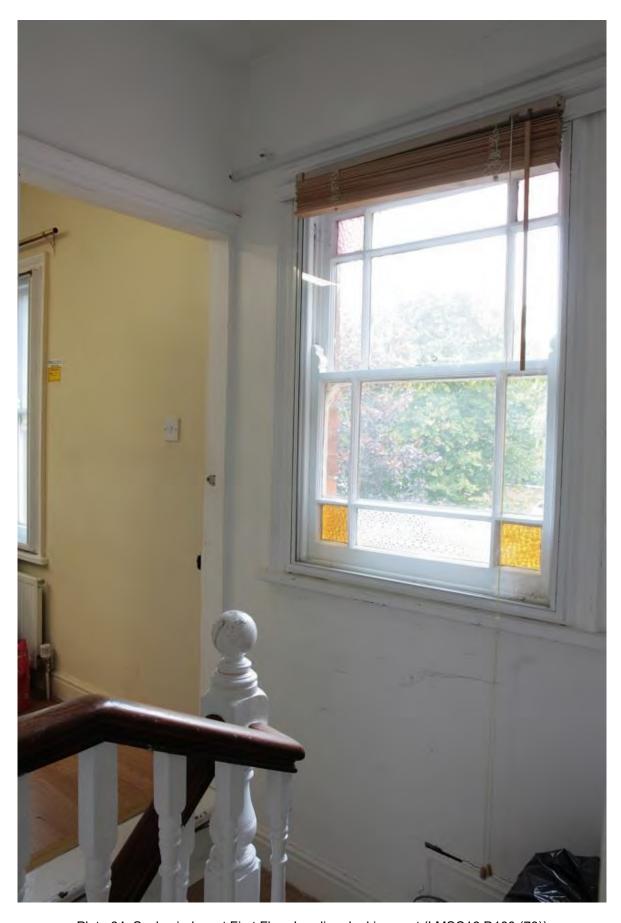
Sash window at First Floor Landing, looking east (LMSC16 D100 (73))
